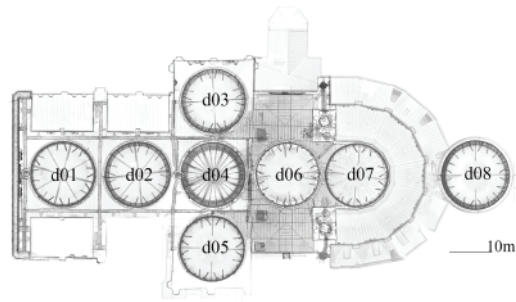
Plan of the domes: façade dome (d01), intermediate dome (d02), *arca* dome (d03), angel dome (d04), Chapel of St Jacob dome (d05), presbytery dome (d06), choir dome (d07), Chapel of the Relics dome (d08). D01, d02, d03 are supposed original. d04, d05, d06 and d07 suffered fire damage in 1749.
